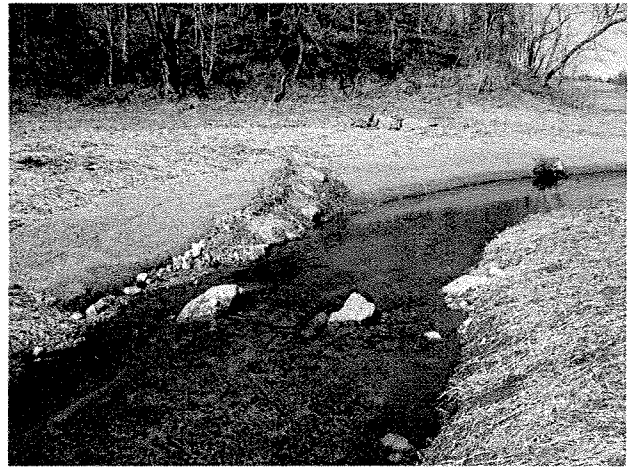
Looking downstream at root wads installed between MC Stations 10+50 and 11+00. (9/27/04)
